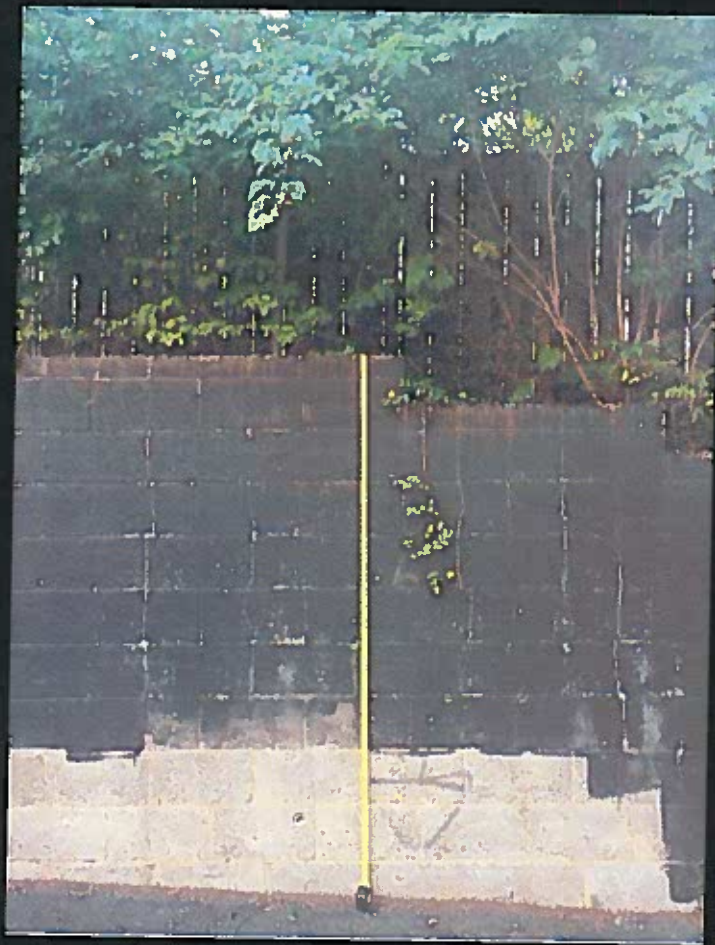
Height of retaining wall (6.5 ft) and fence above (6 ft)
